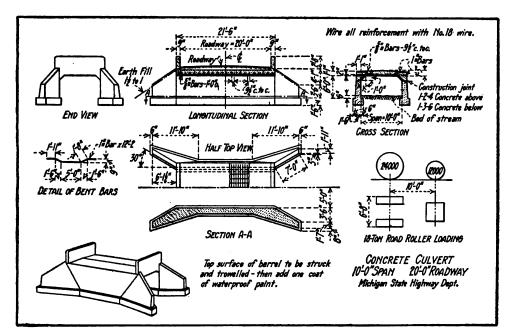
REINFORCED CONCRETE CULVERT. MICHIGAN STATE HIGHWAY DEPARTMENT.
